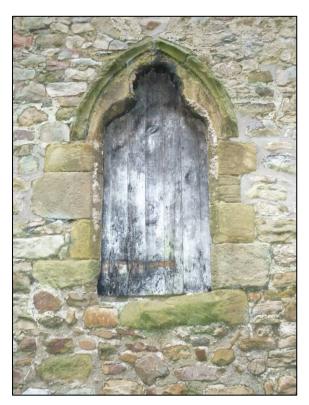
Medieval building, first floor window to north gable, looking S (photo 2/731).
